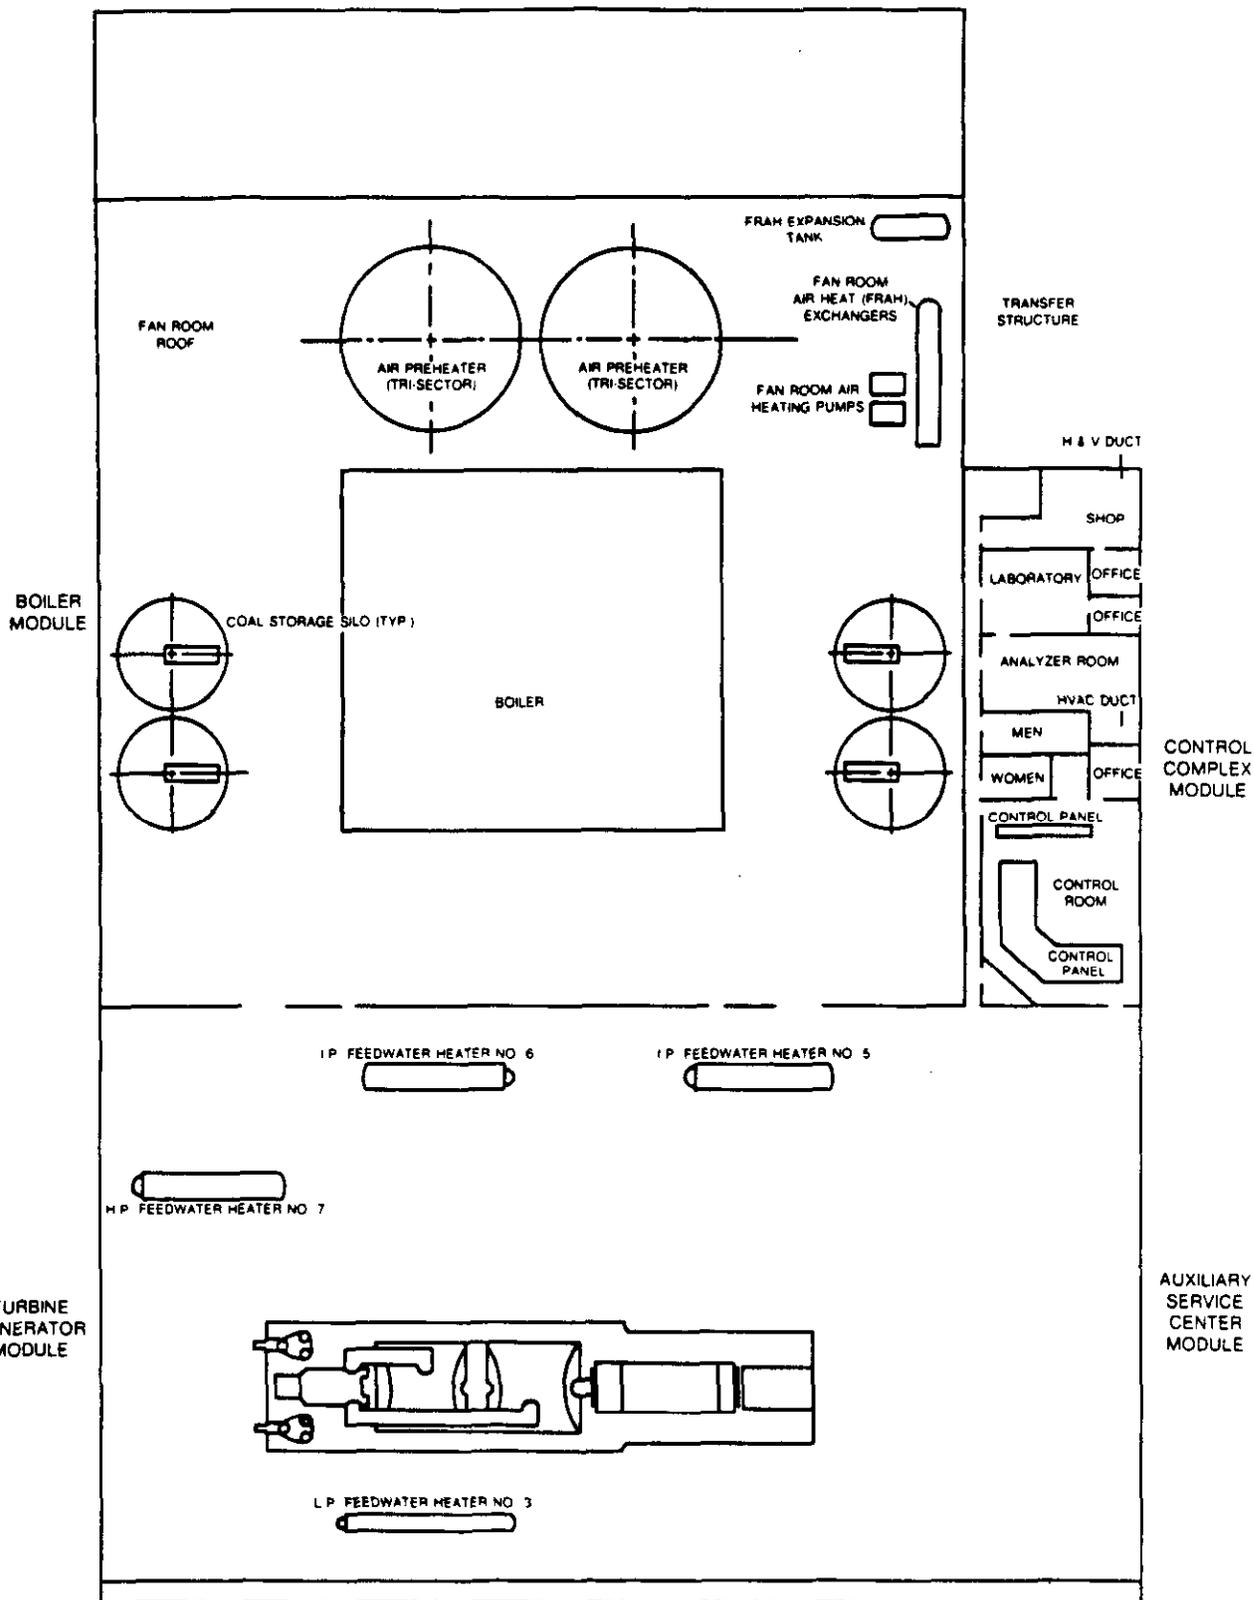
250 MWe Reference Plant Arrangement Plan Operating and Feeder Floor
